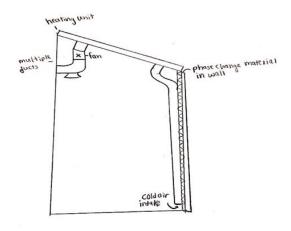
Wall Integrated PCM with Roof Mounted Heating Unit
